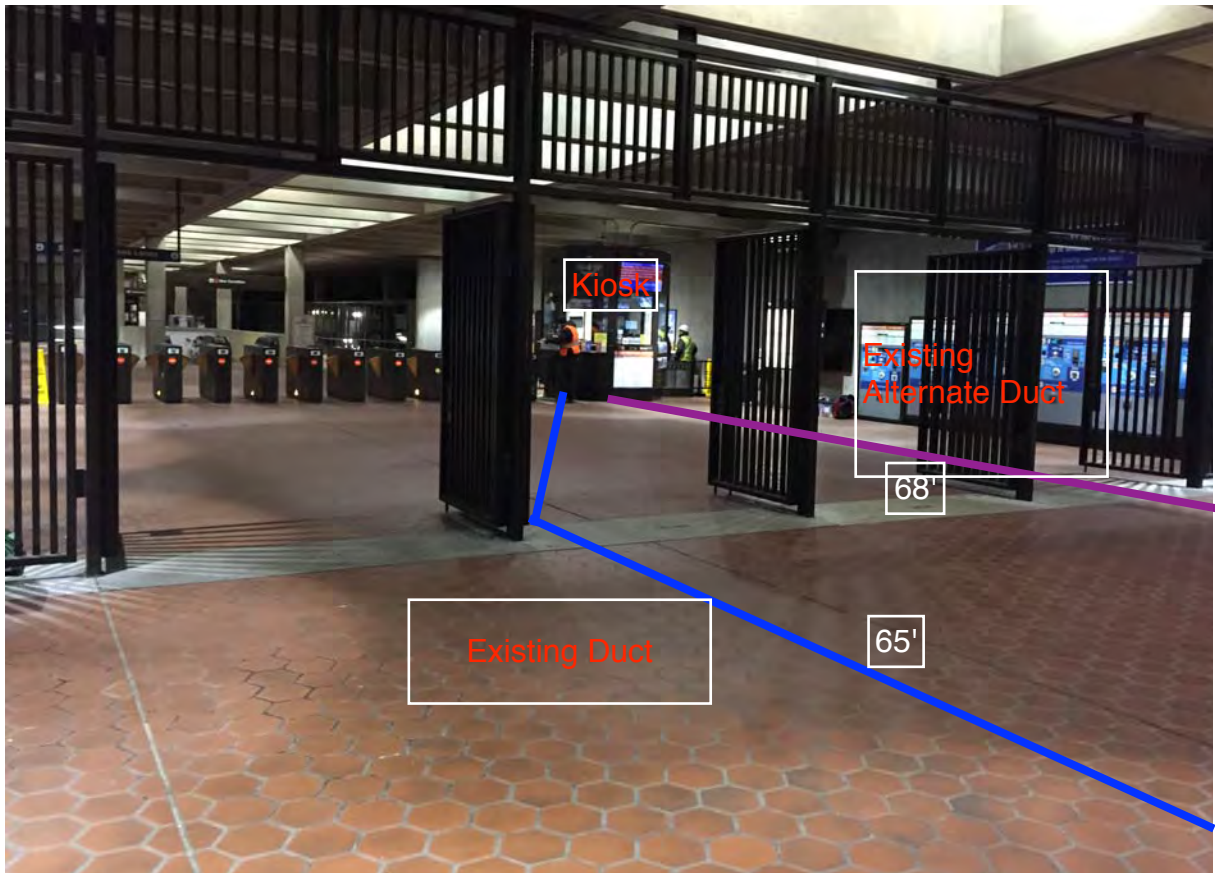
Existing / Proposed duct layout on mezzanine floor
